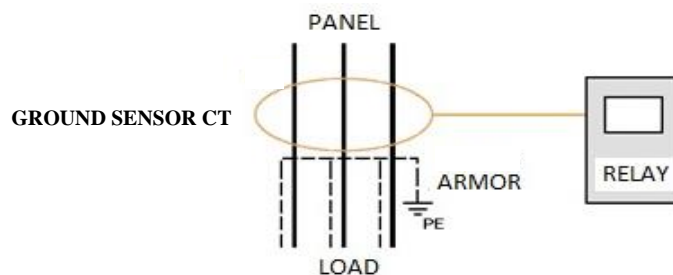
Arrangement for the connection of armoured electrical cables to the grounding bars of panels
